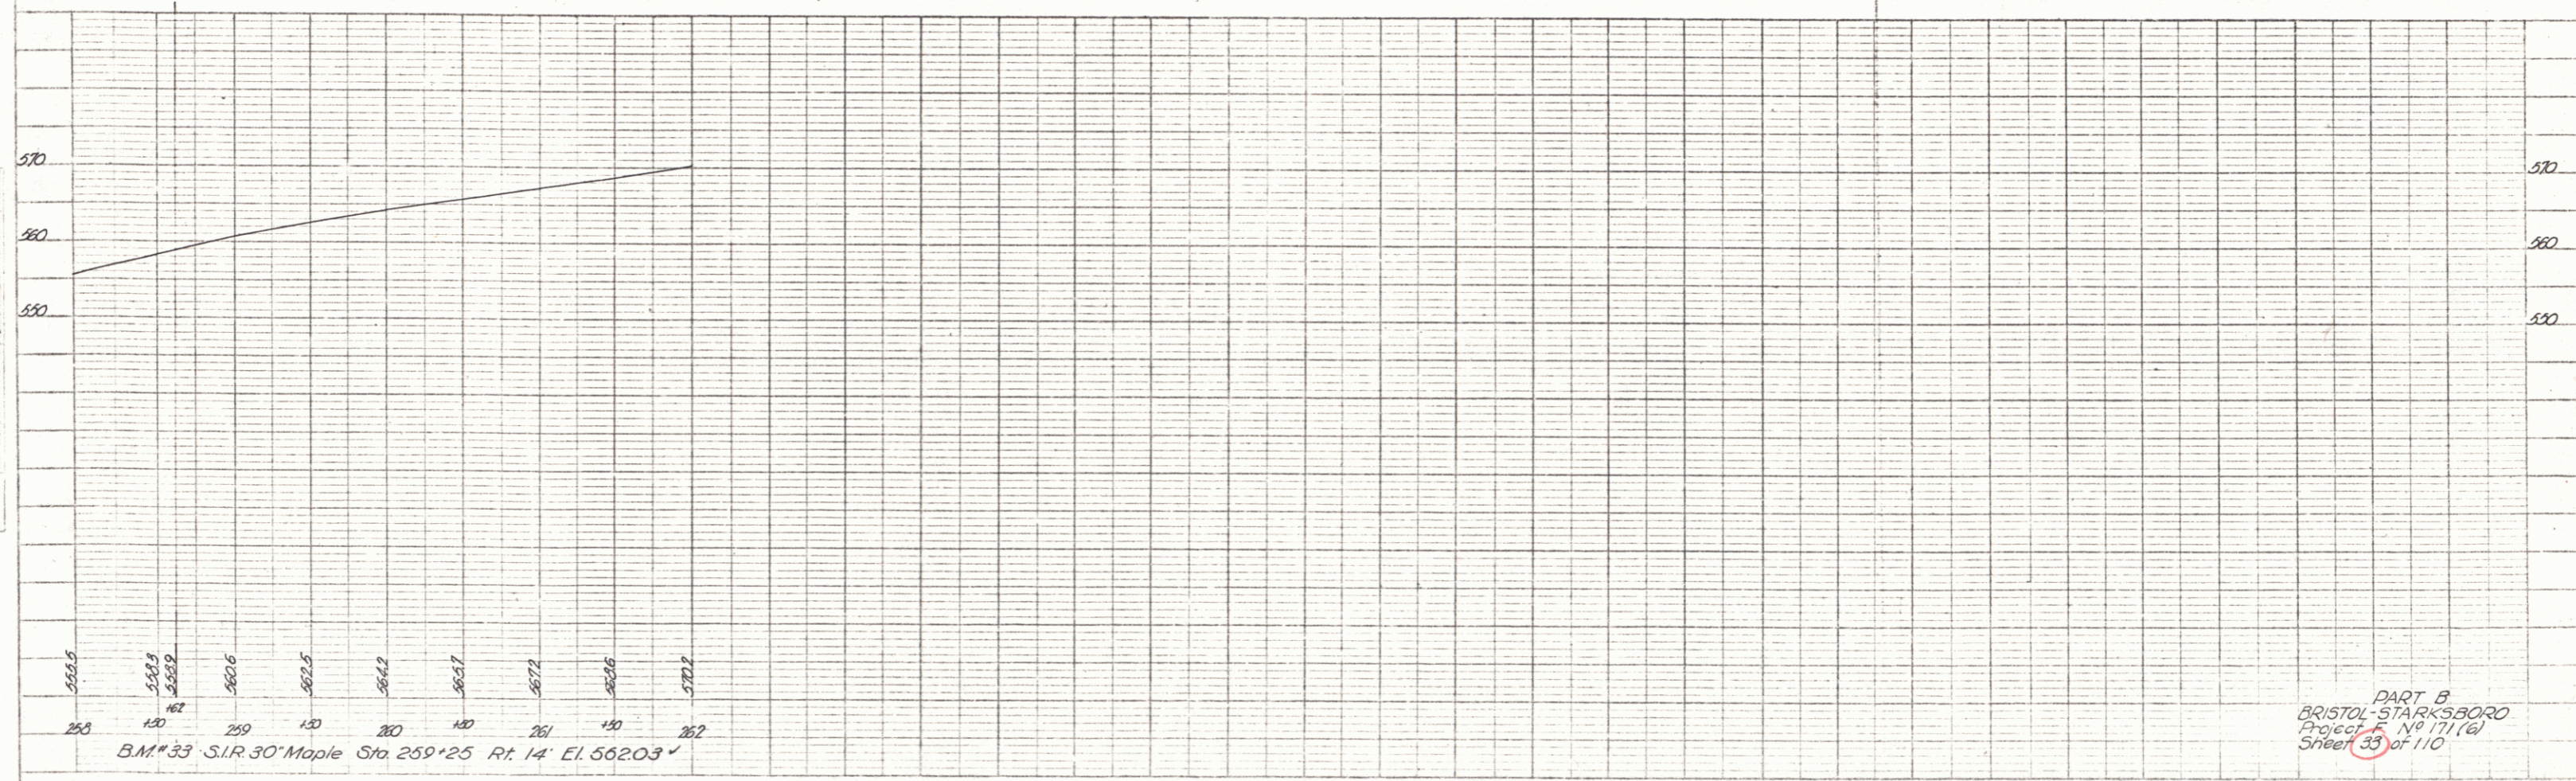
PLAN PROFILE & P&R & STATIONS
